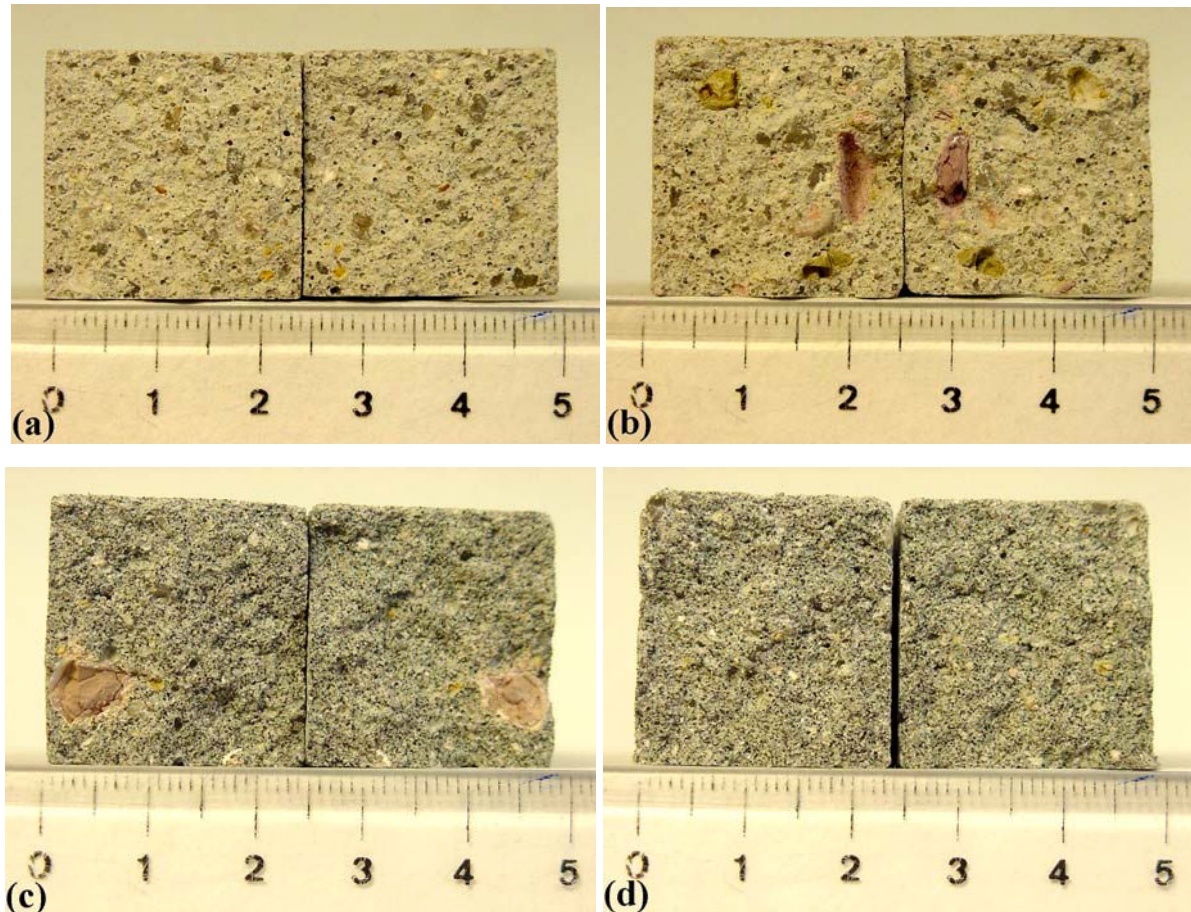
Fracture surfaces of specimens submitted to bending stress, after failure. (a) and (b): control specimen; (c) and (d) specimen with NaOH-treated rubber particles.
